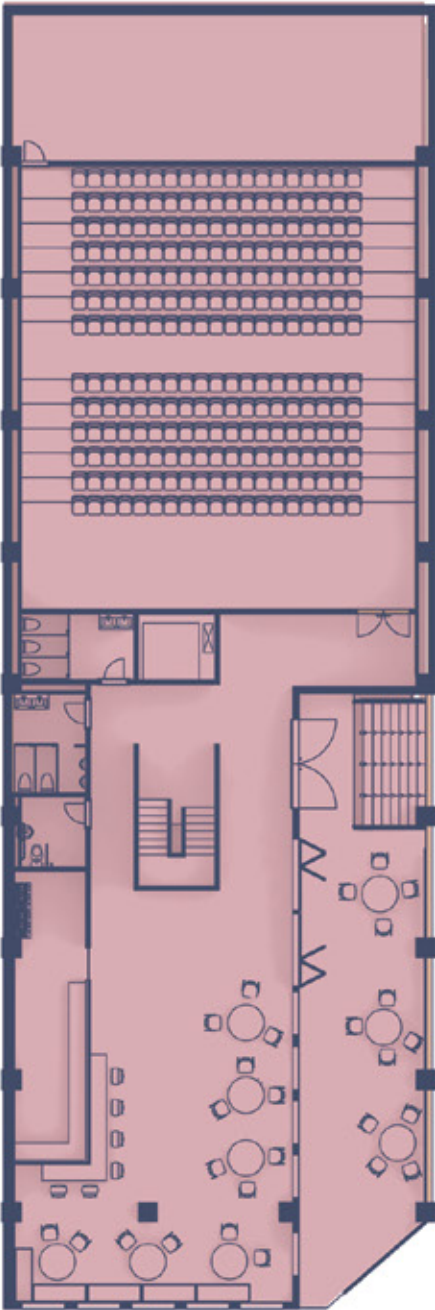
Ground floor plan (not to scale) showing entry, café and cinema.
